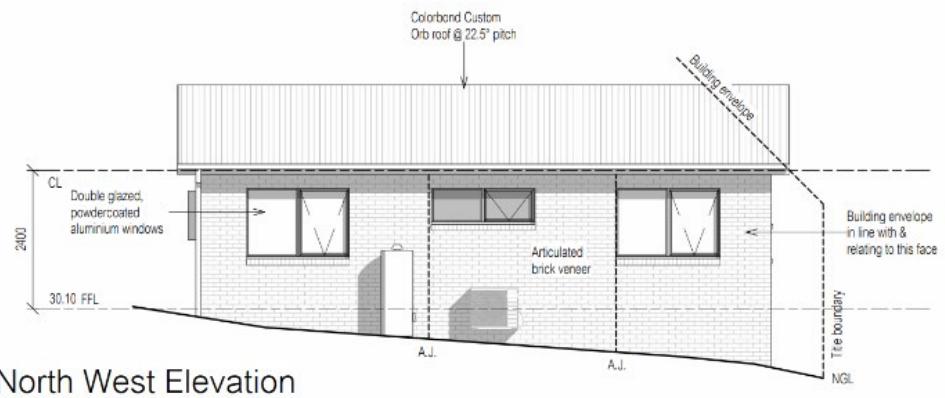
Elevation plans showing building envelope (Source: Submitted Development Plans)
